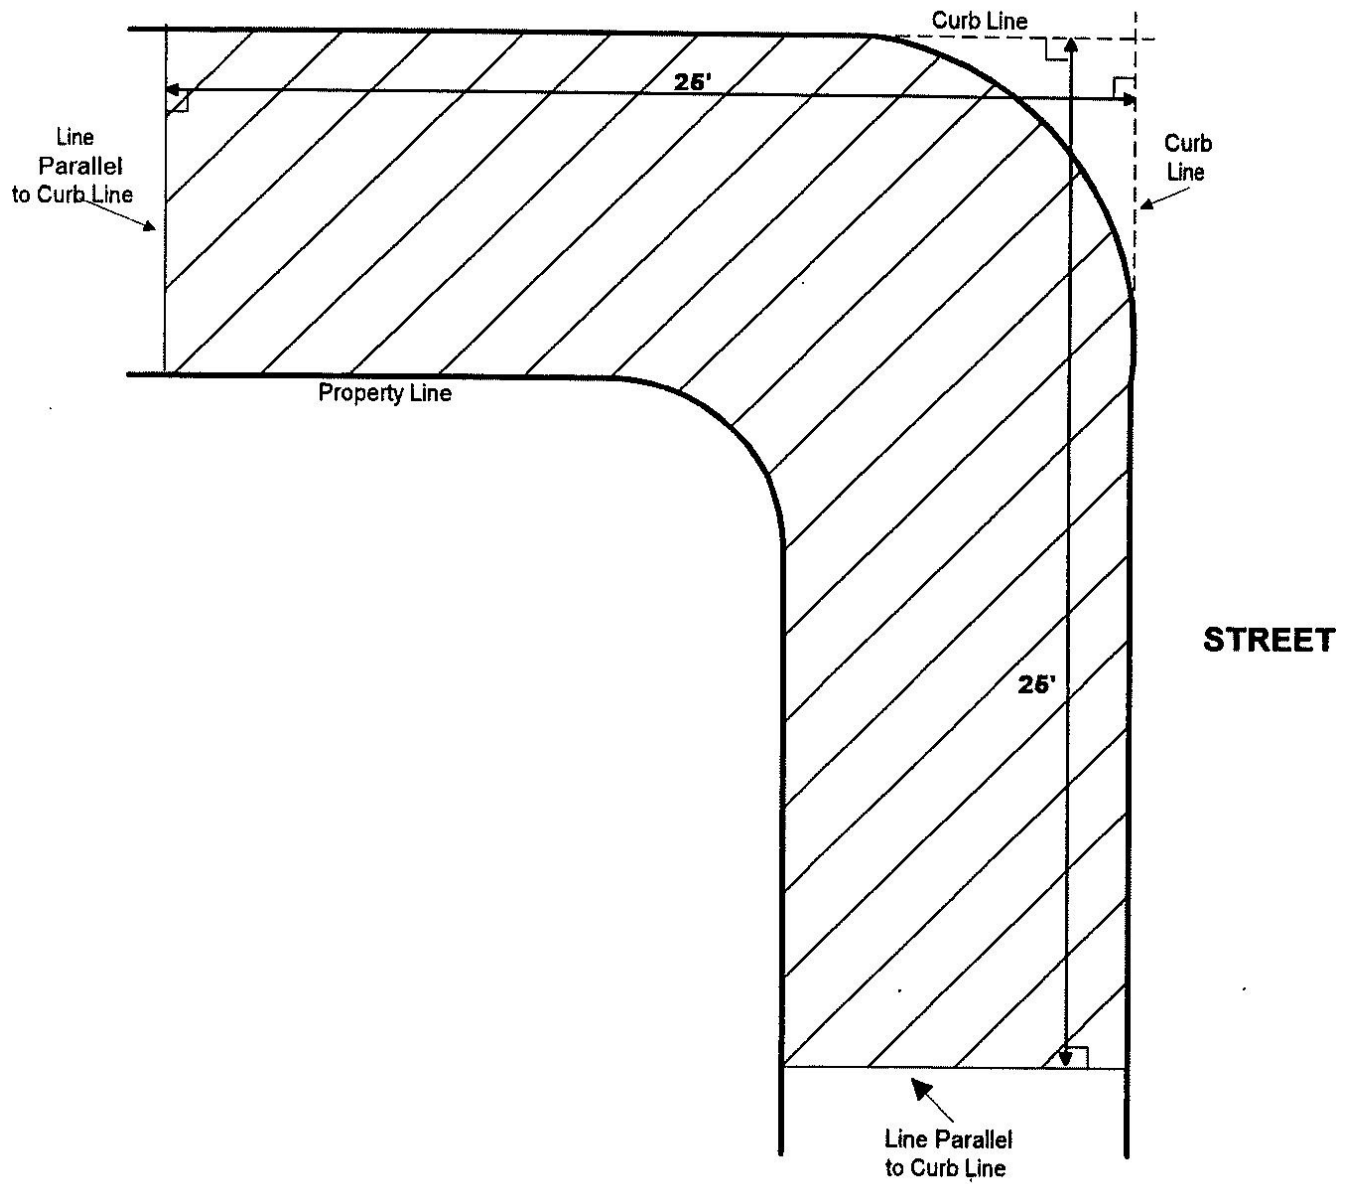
A.4: Street Corner Area With One Marked Crosswalk
